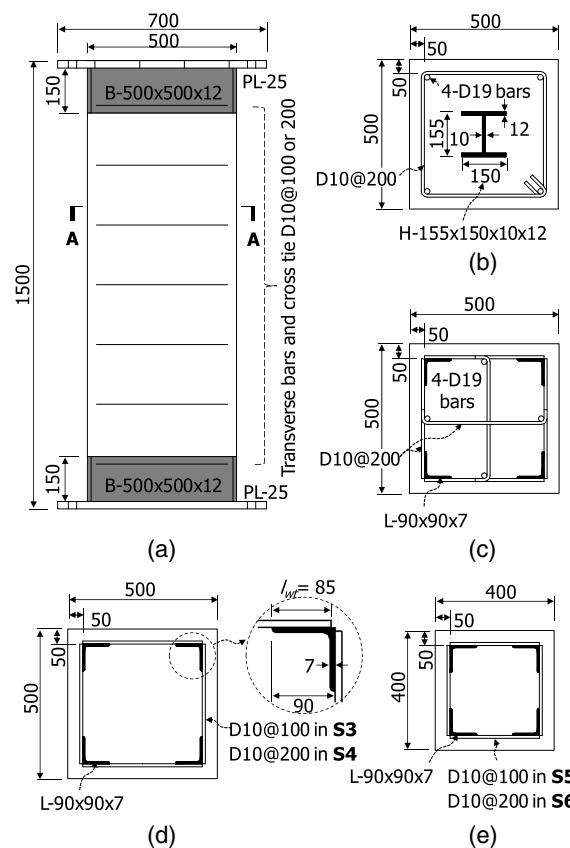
Dimensions and details of compression test specimens (mm): (a) column configuration; (b) S1 (cross section A-A); (c) S2 (cross section A-A); (d) S3 and S4 (cross section A-A); (e) S5 and S6 (cross section A-A)
